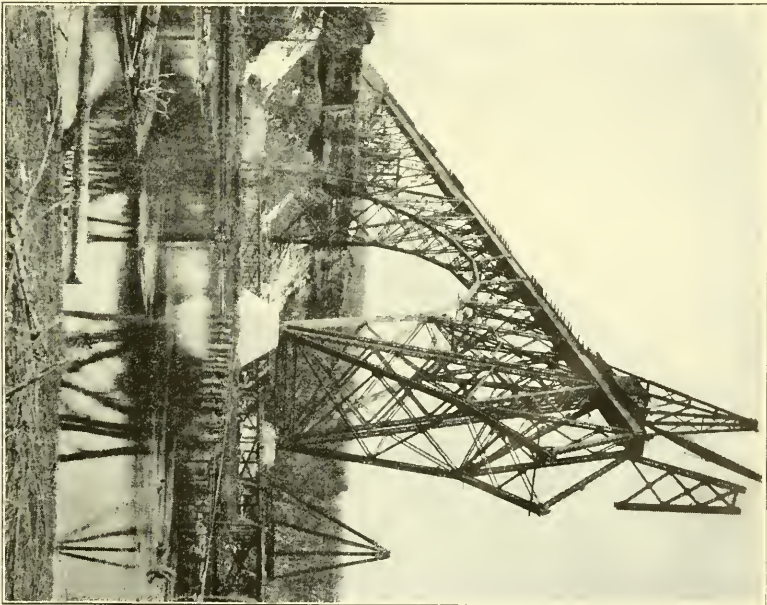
ERECTOR OF HALF OF SECOND ARCH AS A CANTILEVER.
